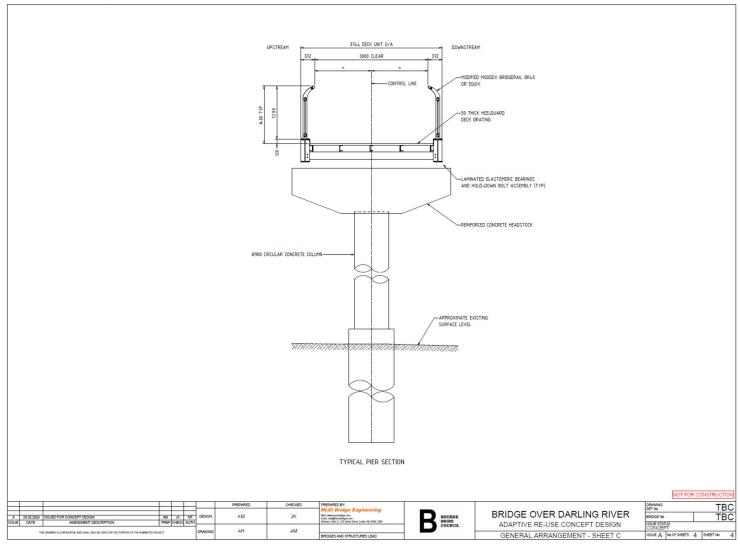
Typical Pier section Source: MLEI Bridge Engineering
